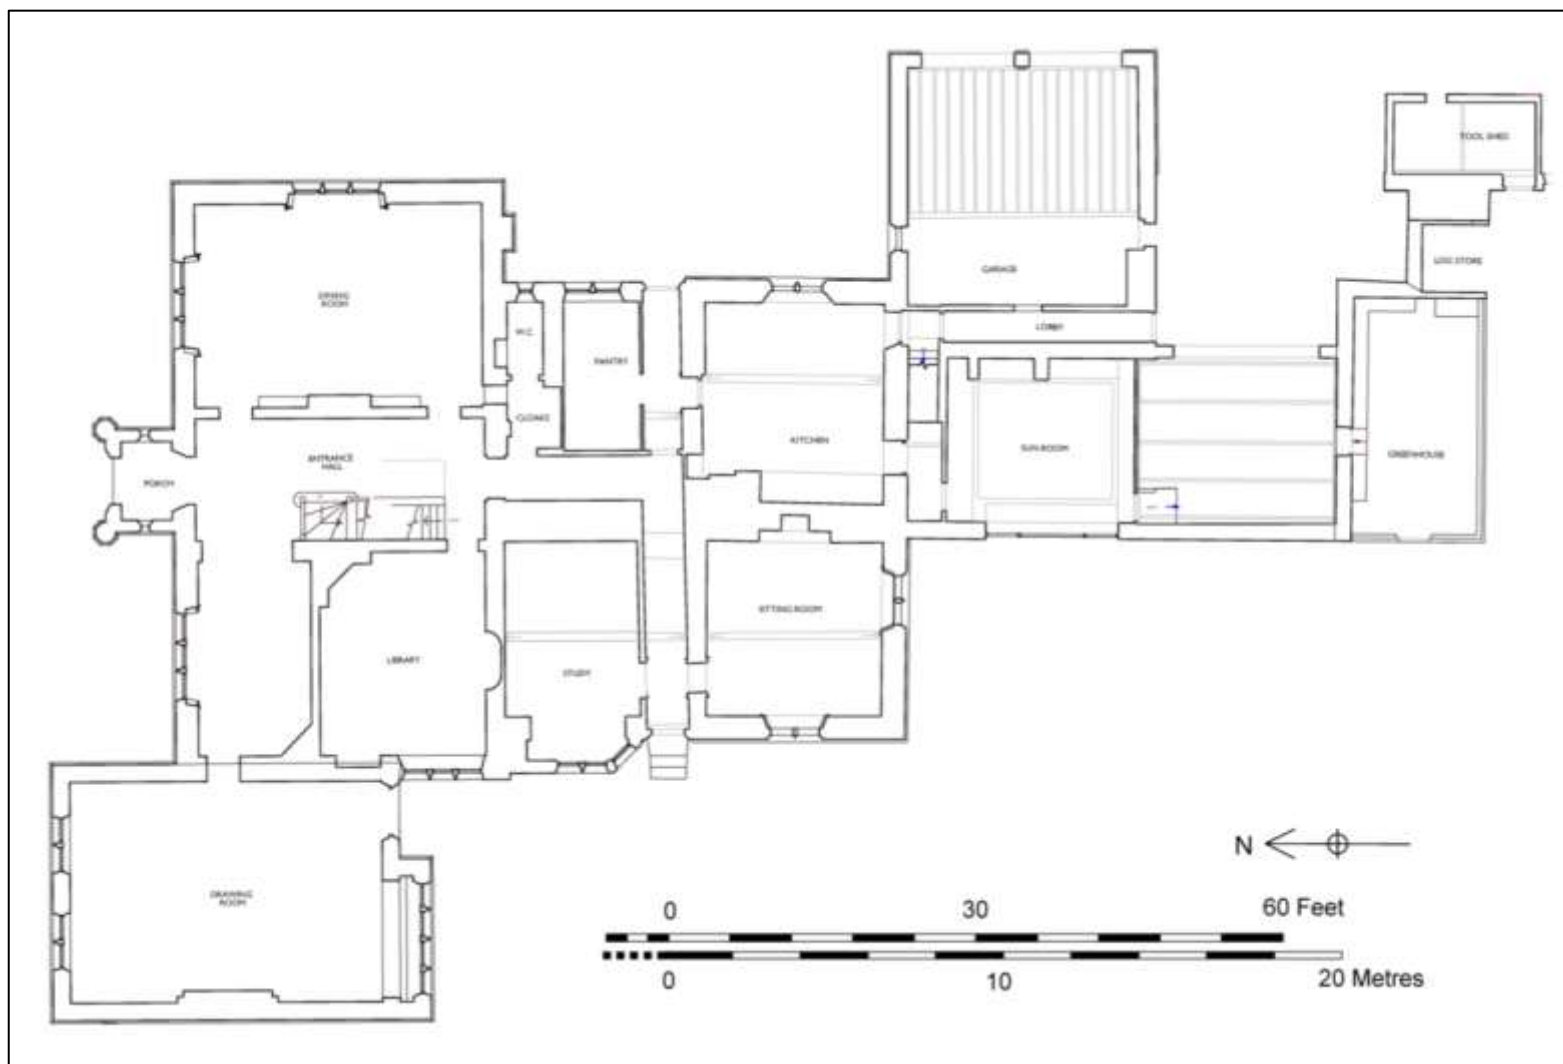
Existing ground floor plan, derived from Nick Cox Architects survey drawing.
